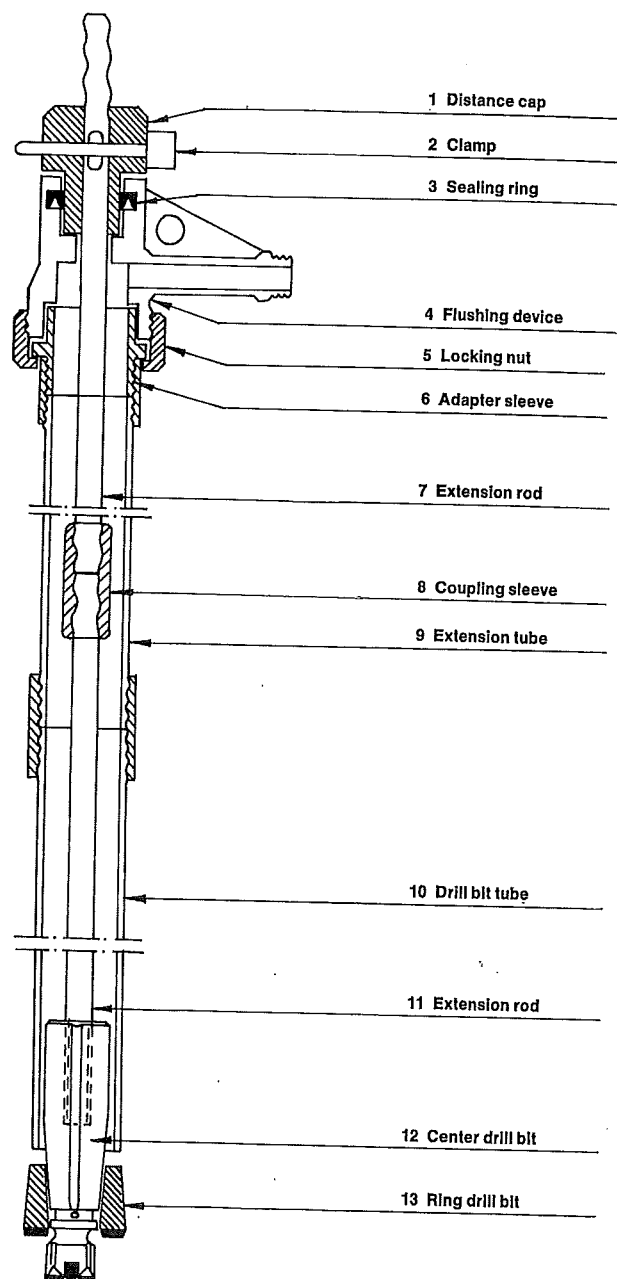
The Alvik J drilling method, with the ring bit left in the hole.
